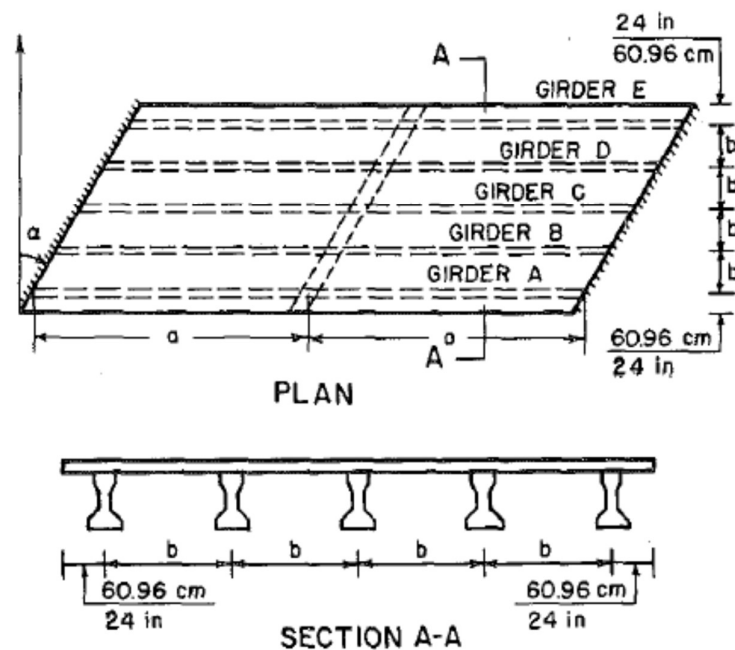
Geometry and structural idealization of the continuous skew slab- and Girder Bridge (Khaleel and Itani 1990)
